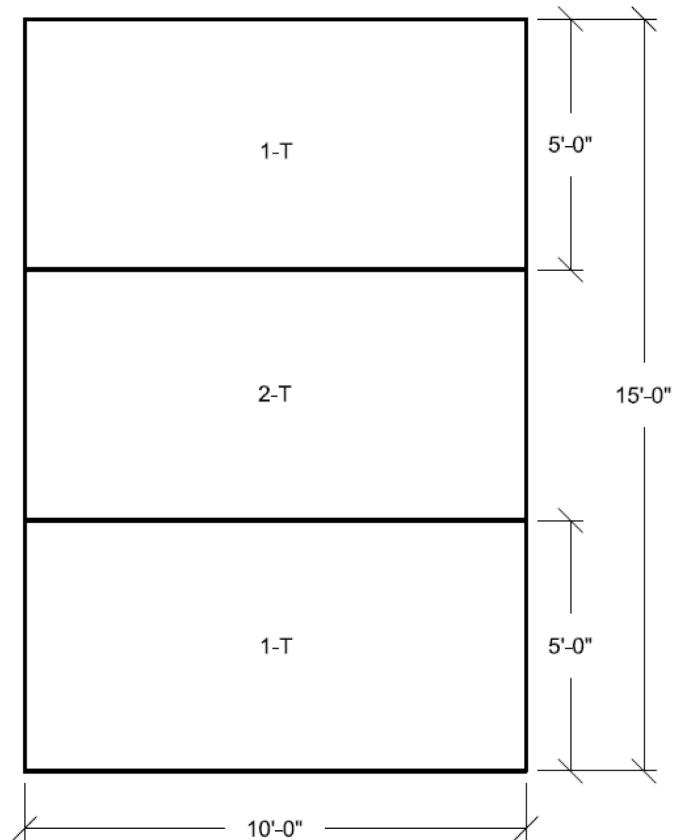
H.6-208 DGFOSV Wall 16 Looking From Outside Transverse Reinforcement Zones
